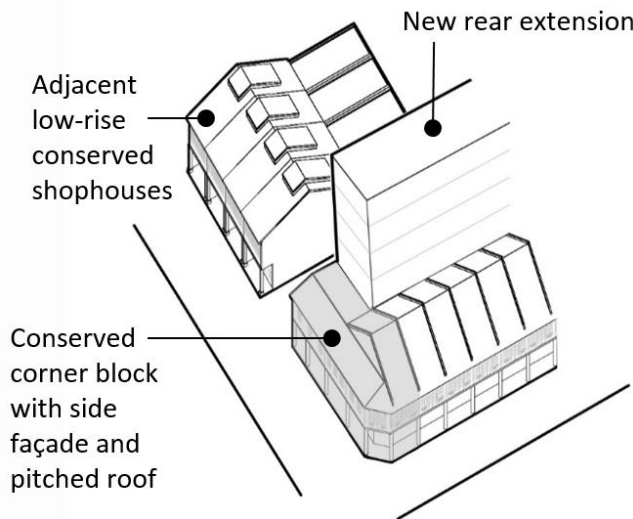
Revised allowable envelope for corner units with side façade and pitched roof
